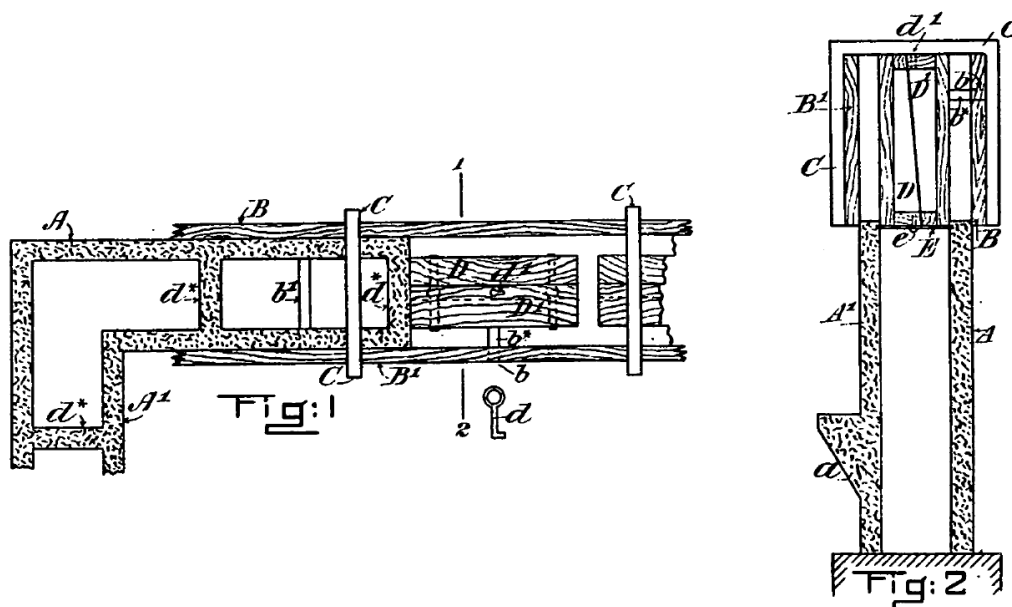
Plan and Cross Sectional View of Camerated Concrete Wall
